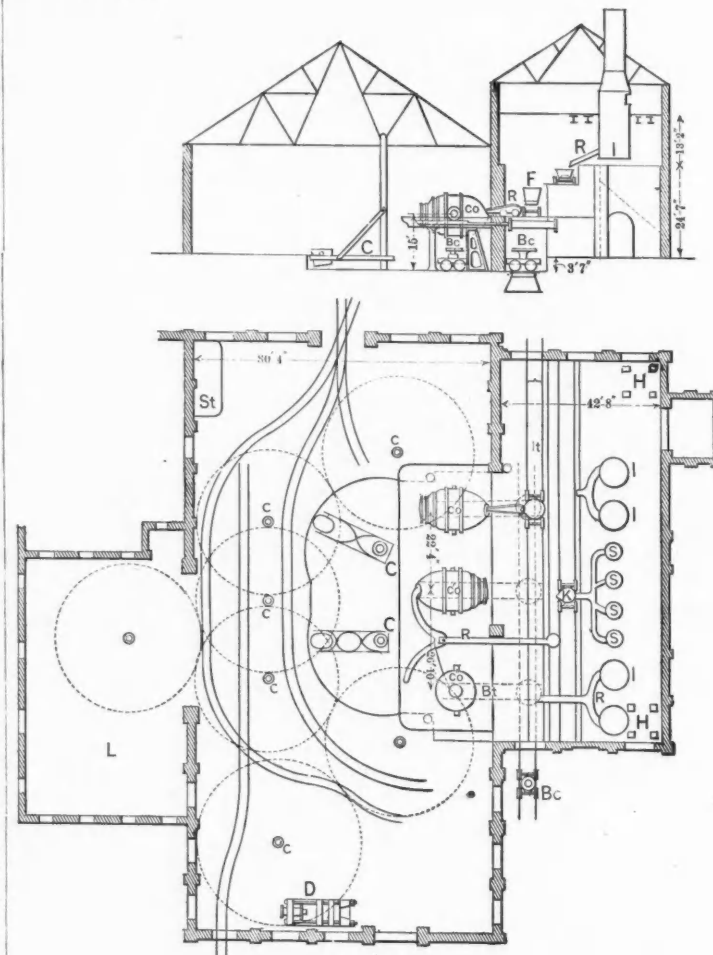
CROSS SECTION AND PLAN OF NEW EDGAR THOMSON CONVERTING MILL.
